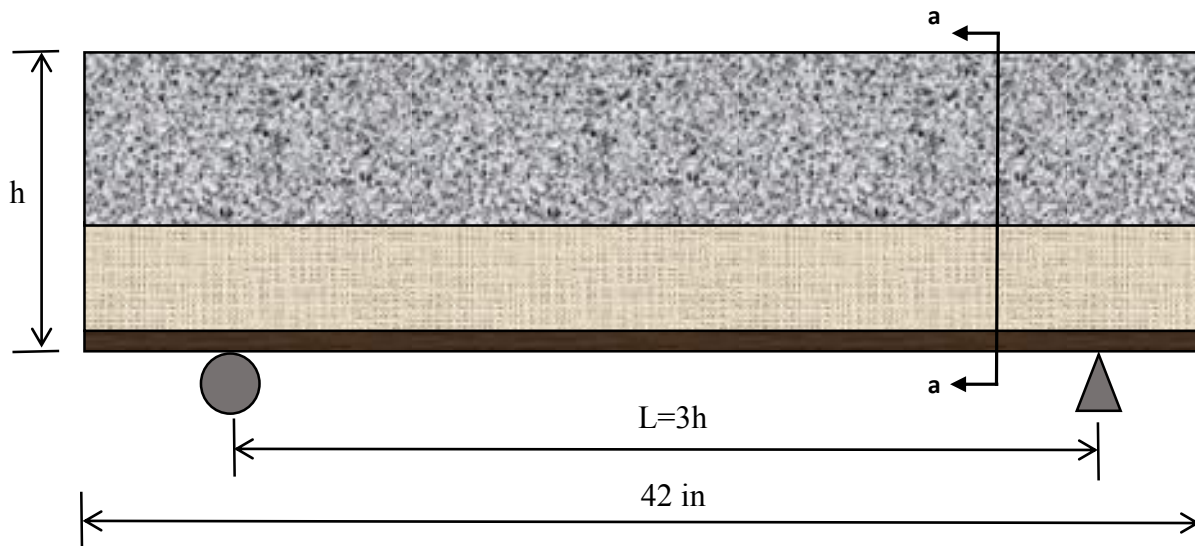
Geometry and reinforcement of the tested deep beam specimens
